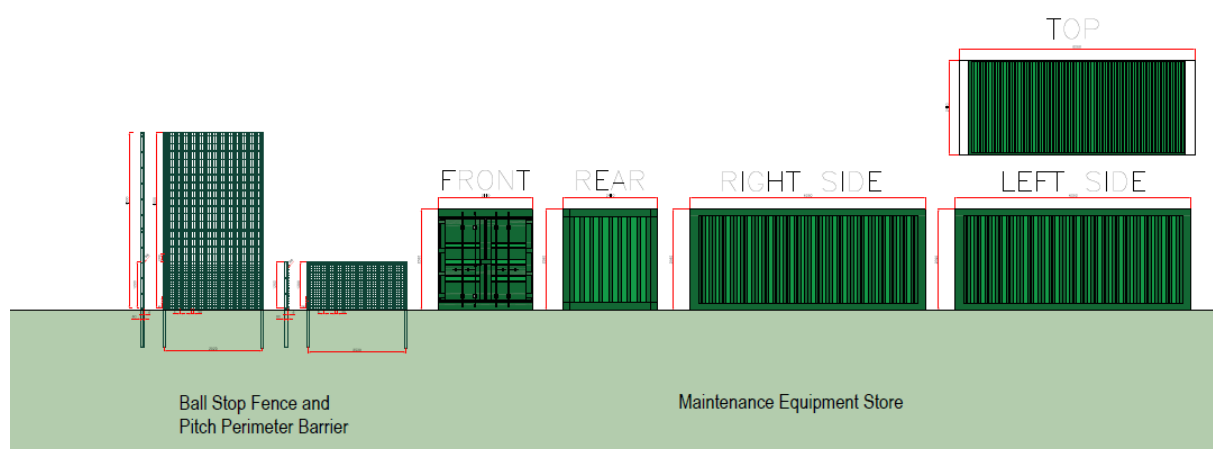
Elevations of Equipment Store, Ball-stop fence and Pitch Perimeter Fence
